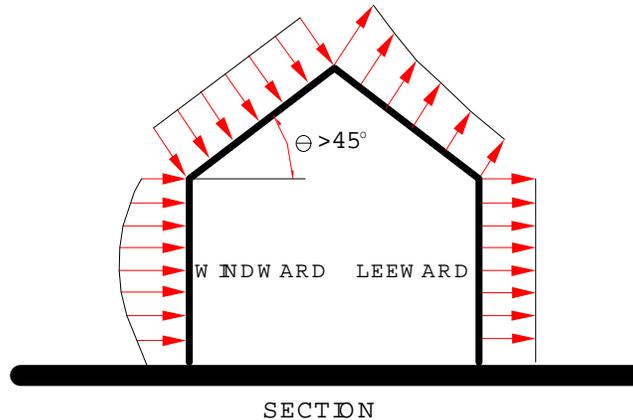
Wind Pressures on High-Sloped Gable Roof
